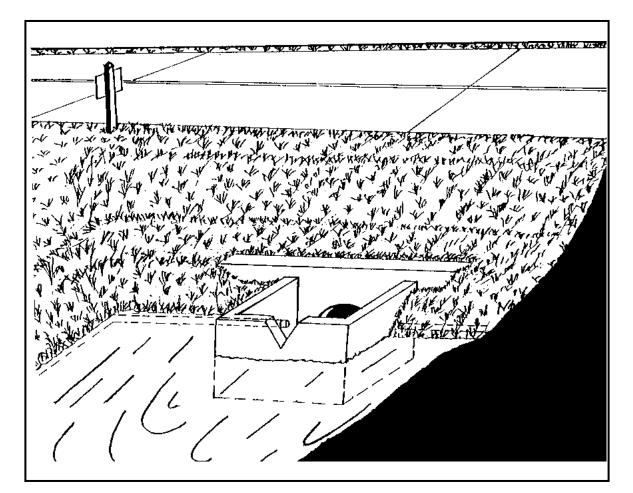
Illustration of Typical "Natural Soil" Bank Filtration System with Box Inlet Drop Spillway and "V" Notched Weir (Wet Detention Facility) Source: NRCS
